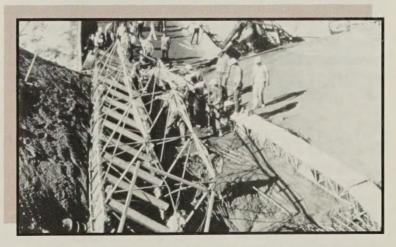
Collapsed Route 198 overpass on the Baltimore-Washington Parkway.
